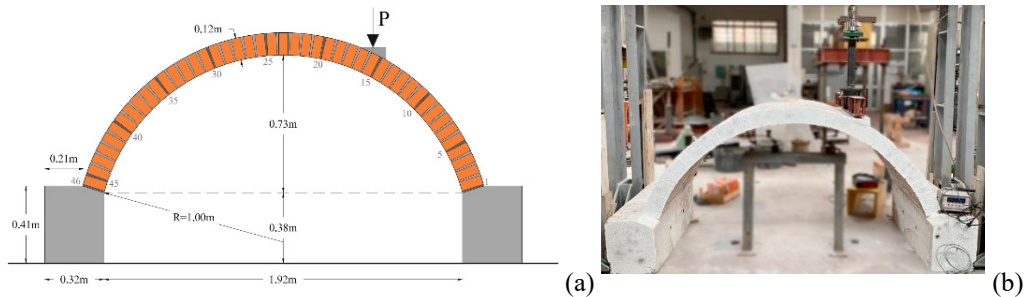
Calcarenite vault specimen used for validation (Campisi et al. 2025): (a) Geometrical layout of the specimen; (b) View of the specimen within the testing apparatus.
